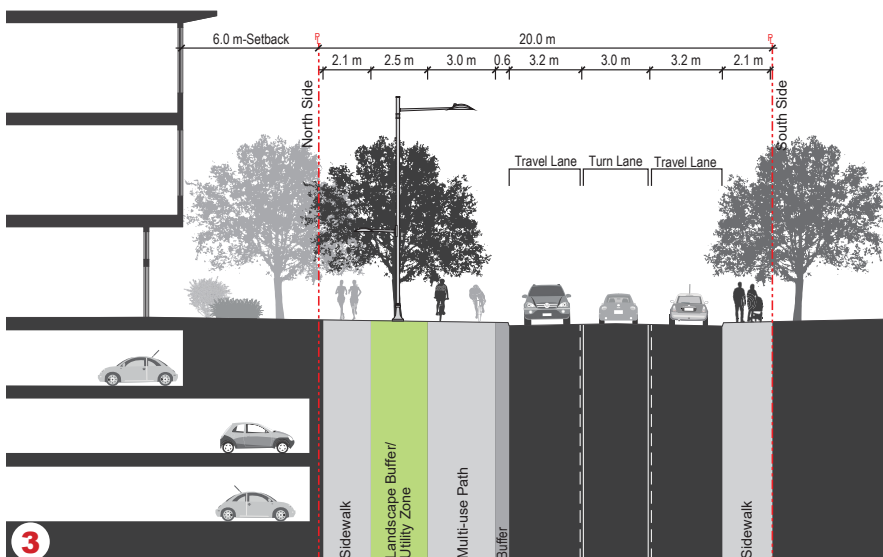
Proposed street right-of-way cross-section - Vanderhoof Avenue (typical)
